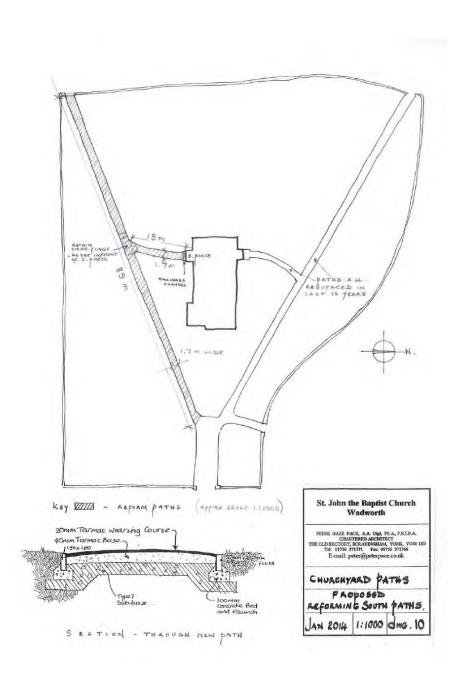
FOOTPATH REFORMING WORKS (Plan provided by Peter Pace Architect)
